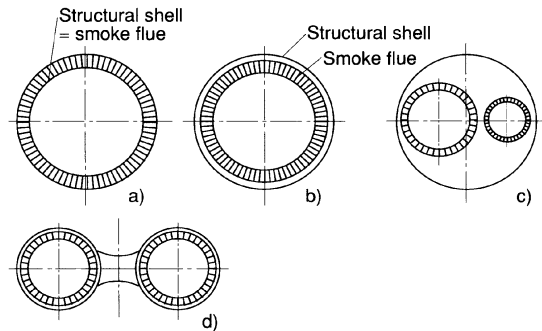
Chimney construction: a) with internal insulation, b) with additional smoke tube, c) multi-flues, d) connected chimneys
